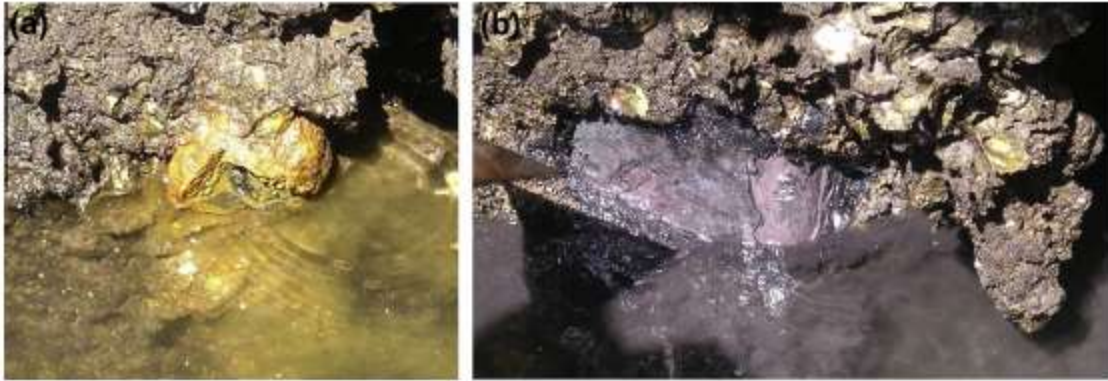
Local corrosion of sheet piling (Melchers et al., 2014)
